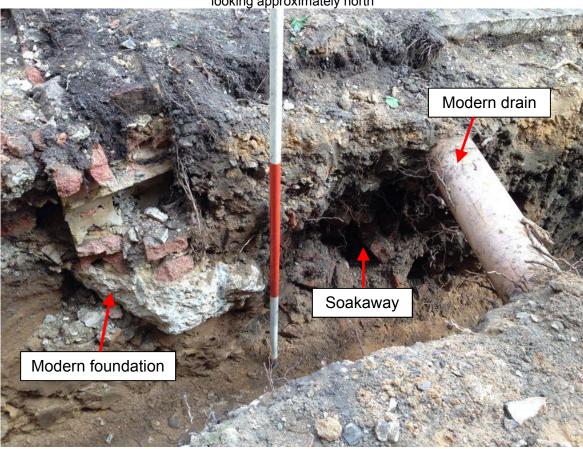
Trench showing a modern foundation, drain and earlier soakaway, looking approximately north
